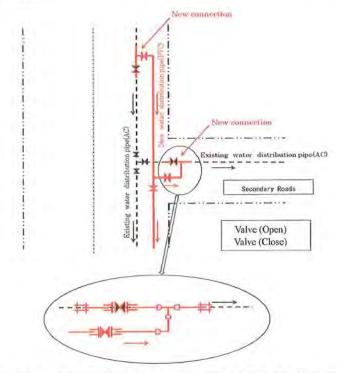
Conceptual diagram of connecting existing and new distribution pipe
